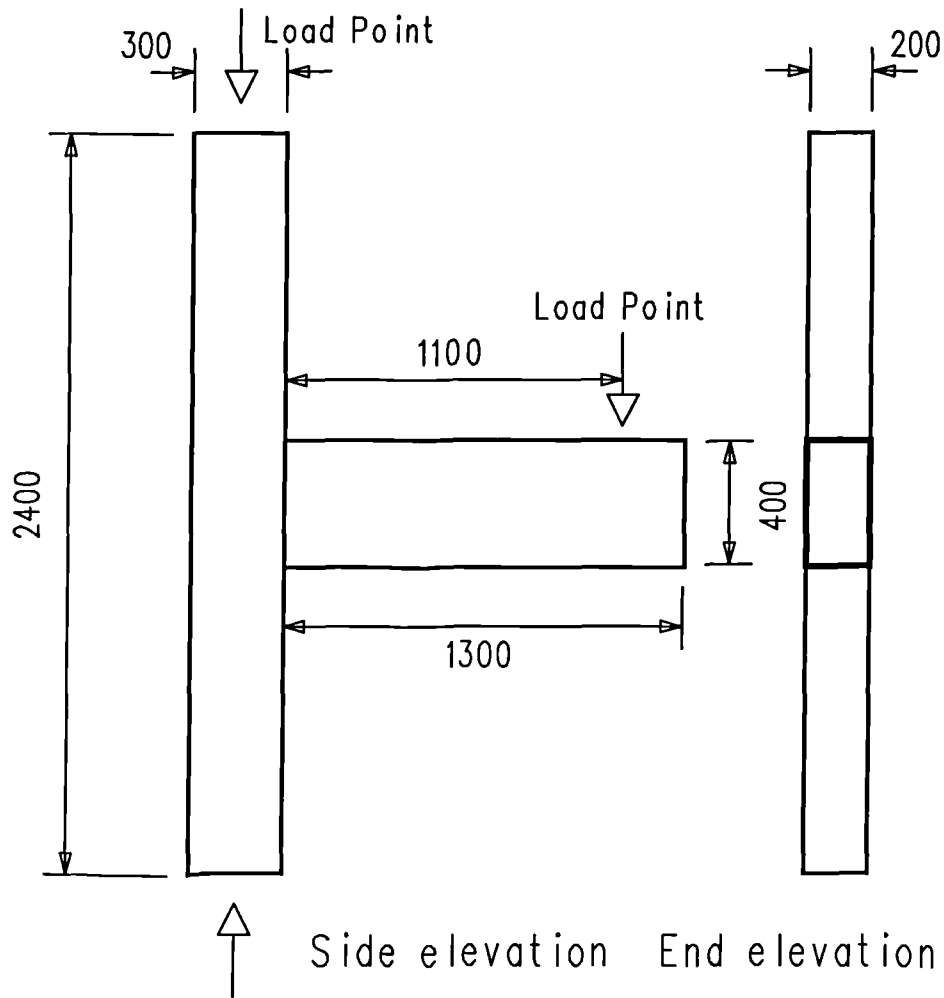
Specimen layout (dimensions in mm) - Reys de Ortiz [10]
